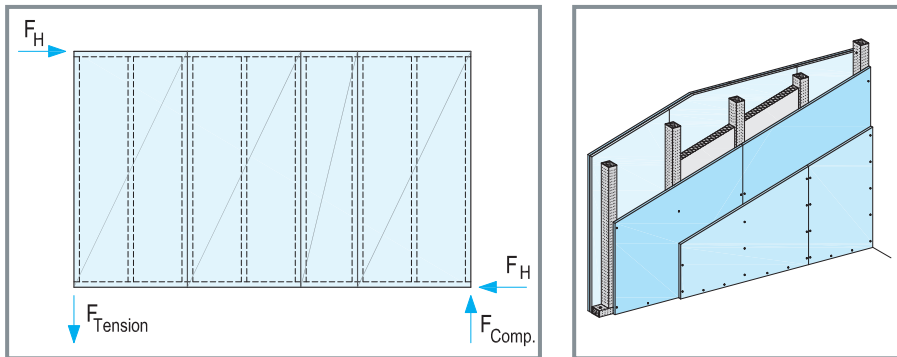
Structural wood frame wall panels, load diagram and construction
